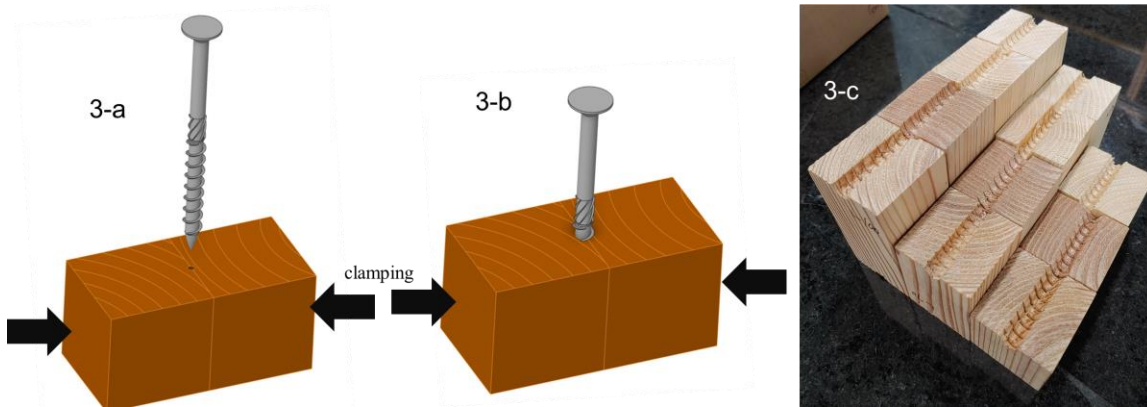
Process of making an embedment specimen (a- clamping, b- drilling, and c- specimens)
